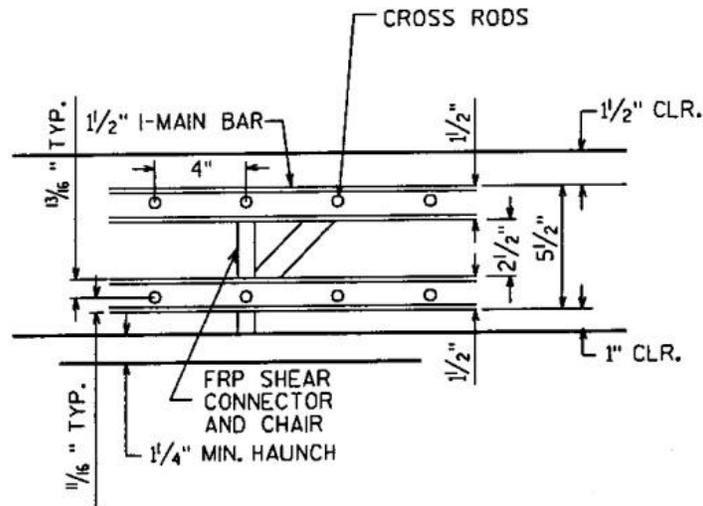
US 151 over De Neveu Creek FRP deck reinforcement – 1
